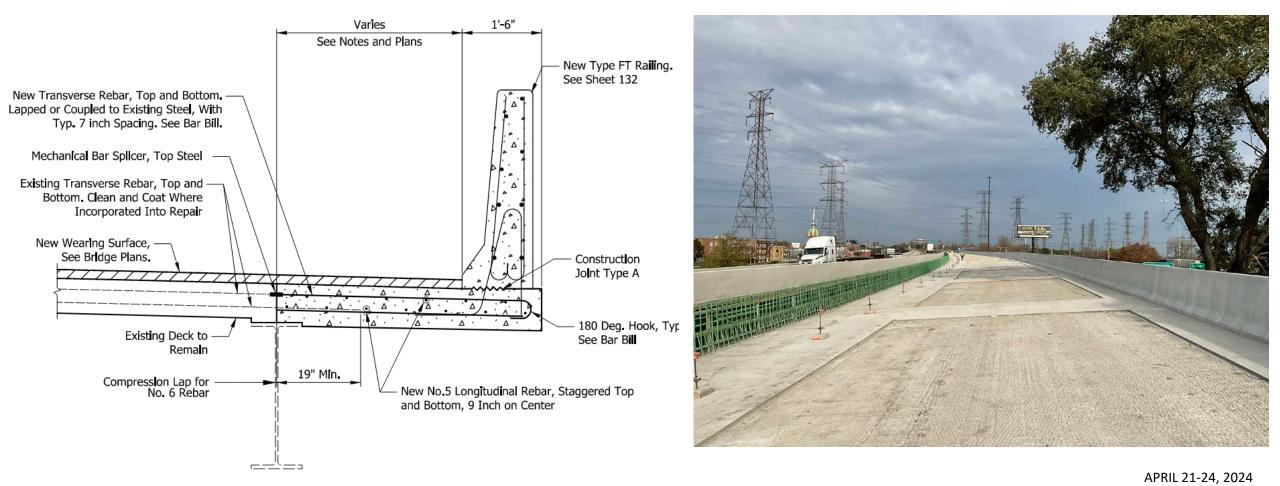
A.1 - REMOVAL OF ORIGINAL BARRIER Scale: 3/4" = 1'-0"
